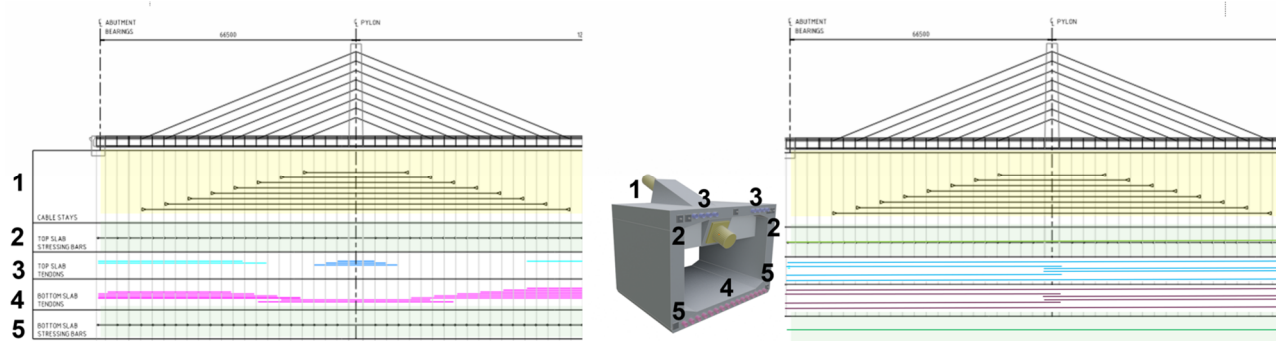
Conventional PT layout (left) and alternative PT layout (right).
